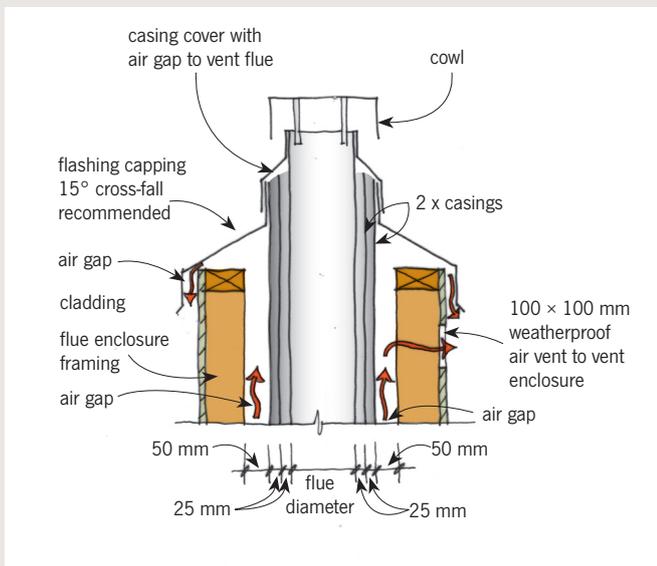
Roof penetration with double casing with 25 mm air gaps. (Note: large proprietary roof flashings are outside the scope of E2/AS1.)
